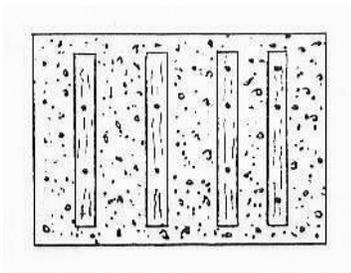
The illustration at left is a plan view for a V-cylinder compressor foundation (see Figure 3.35). Timber footers are embedded in a concrete rectangle around 3 by 4 feet in area. Source: Eric Twitty.
